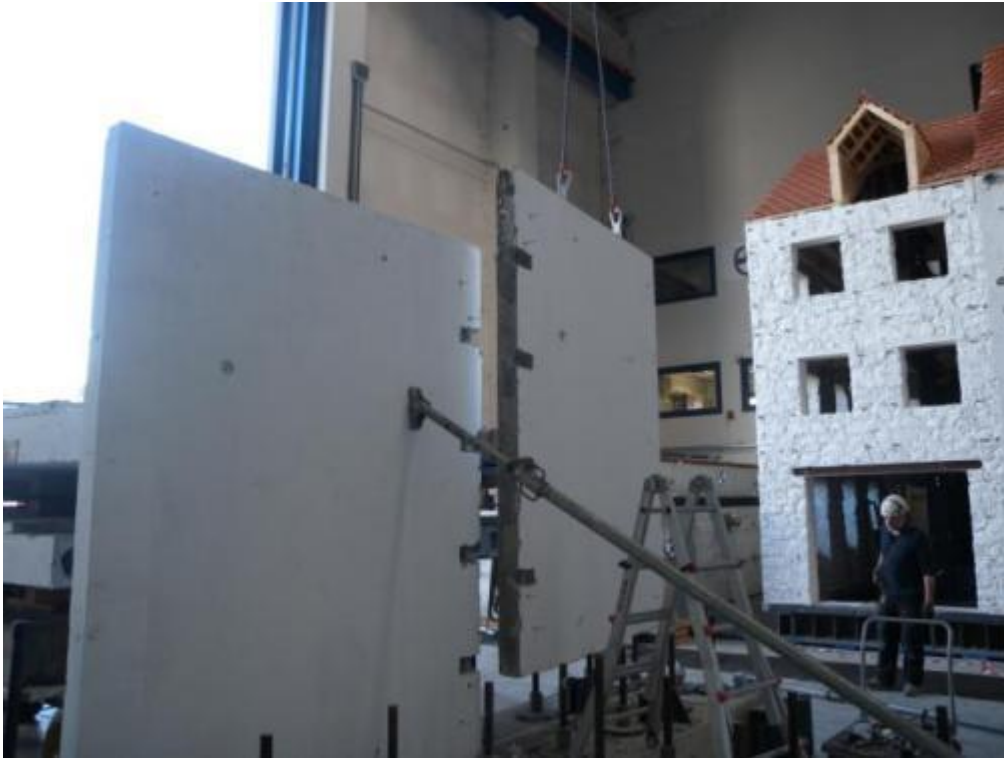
Uplifting of one of the ground-floor transversal walls – North side.
